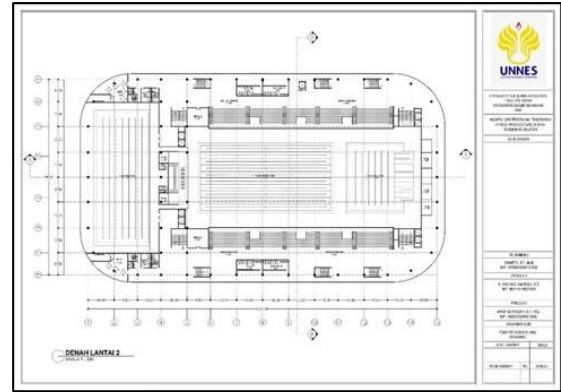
2<sup>nd</sup> Floor Plan Main Building
